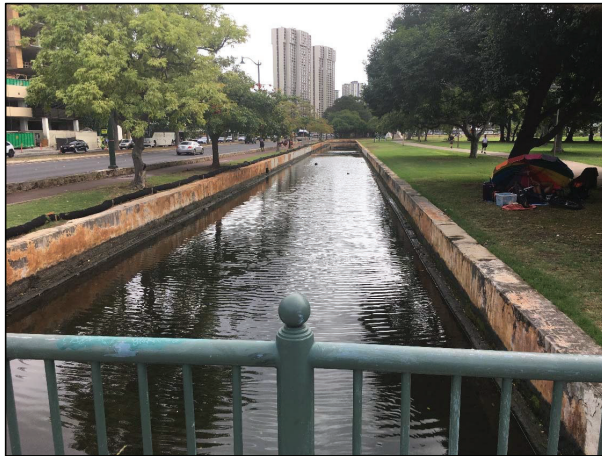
Drainage canal with stucco boulder wall parallel to Ala Moana Boulevard, view to east
